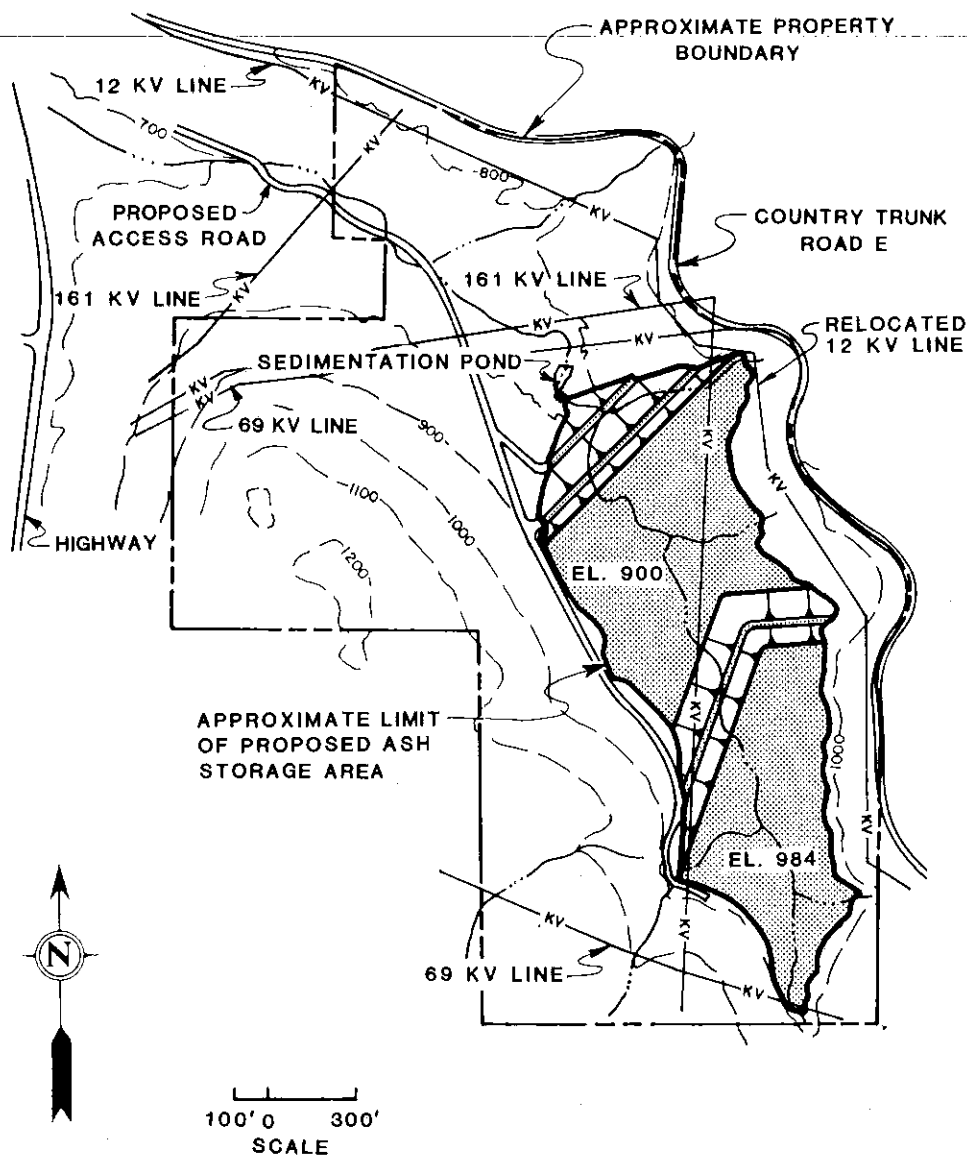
Case Study - Site 1 Conceptual Plan for Dry Ash Disposal Area
